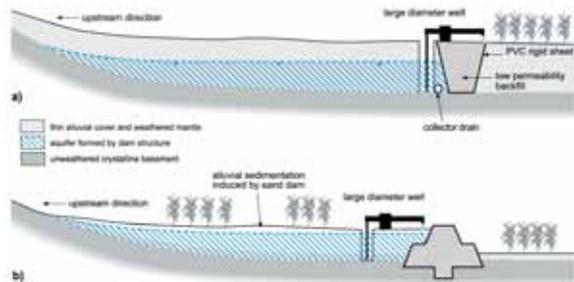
Typical design of subsurface dam (Source: GWMATE)
